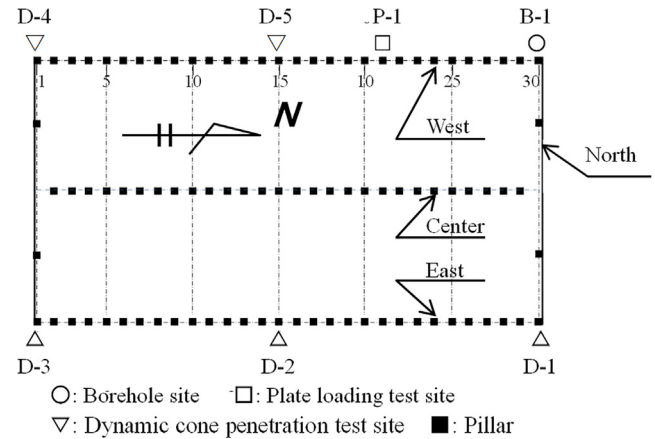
Layout of pillars in the West Cocoon Warehouse.
